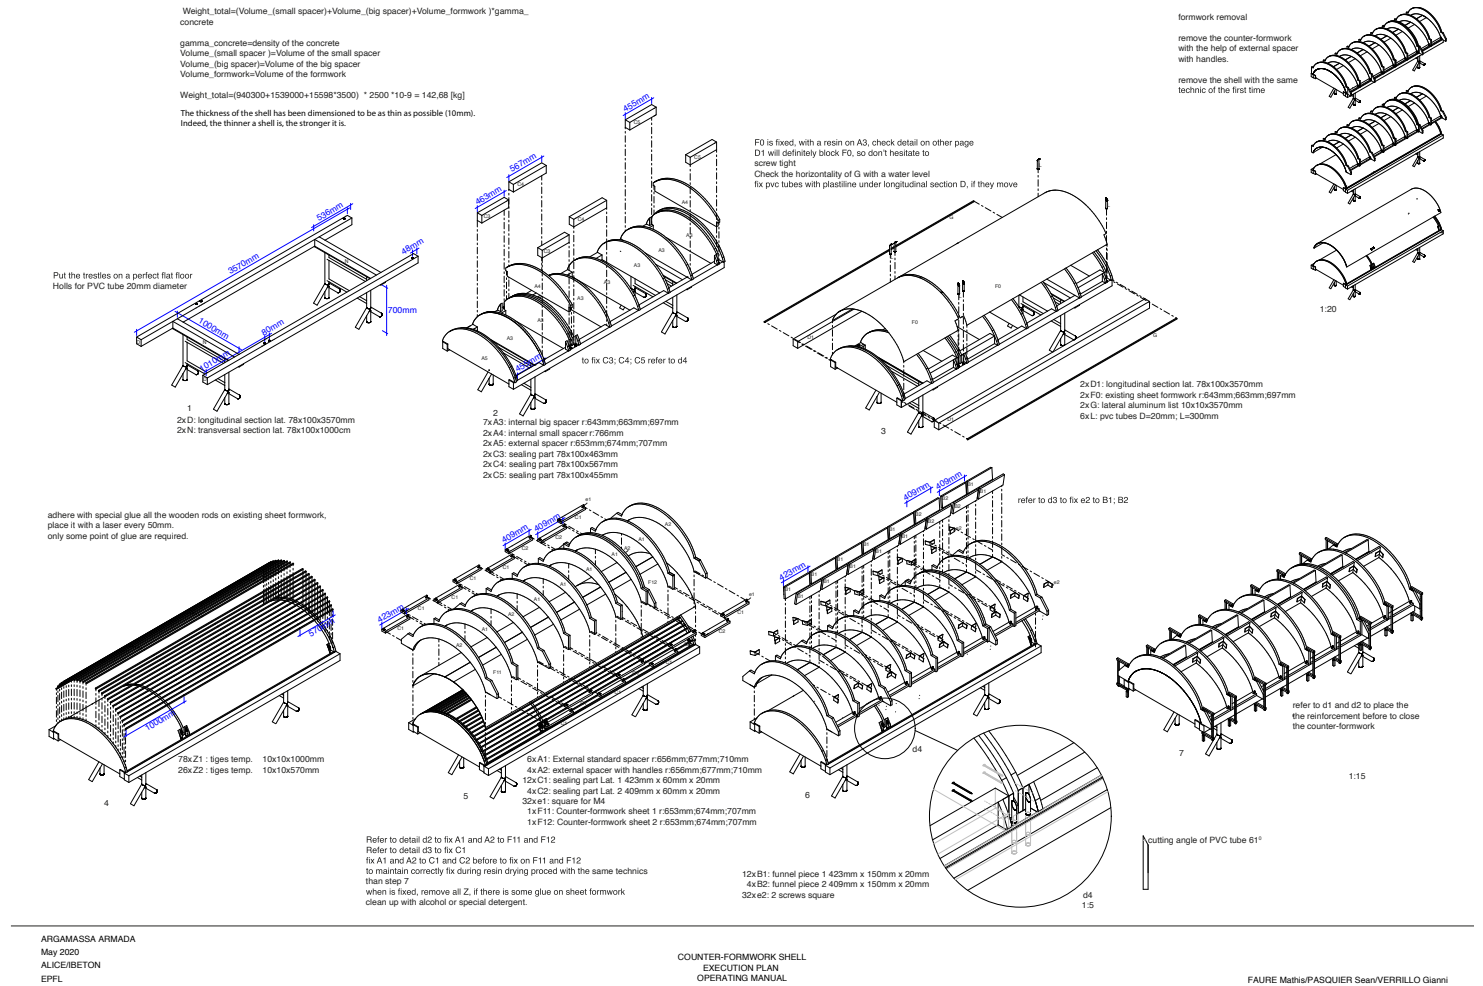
Drawing of upper part of mold of barrel shell vault, sheet 2, 2020
